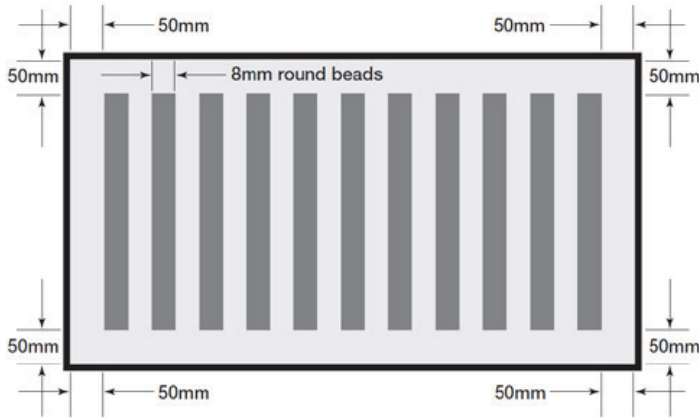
Example of adhesive bead placement for dECO Quiet Panel for 12mm and 25mm 2420 x 1210mm
